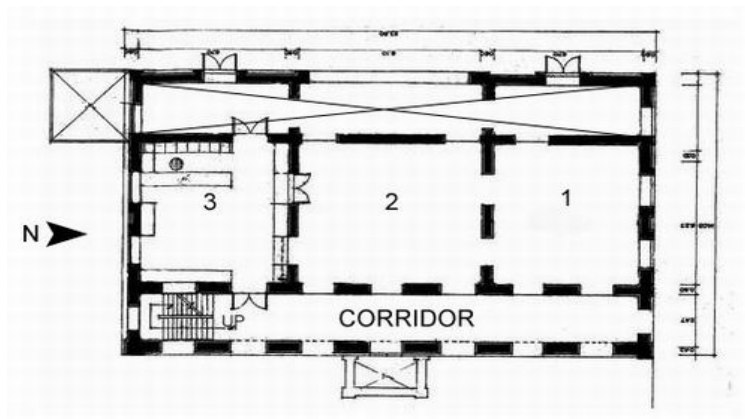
Tamnak Pannarai : Ground Floor Plan.
